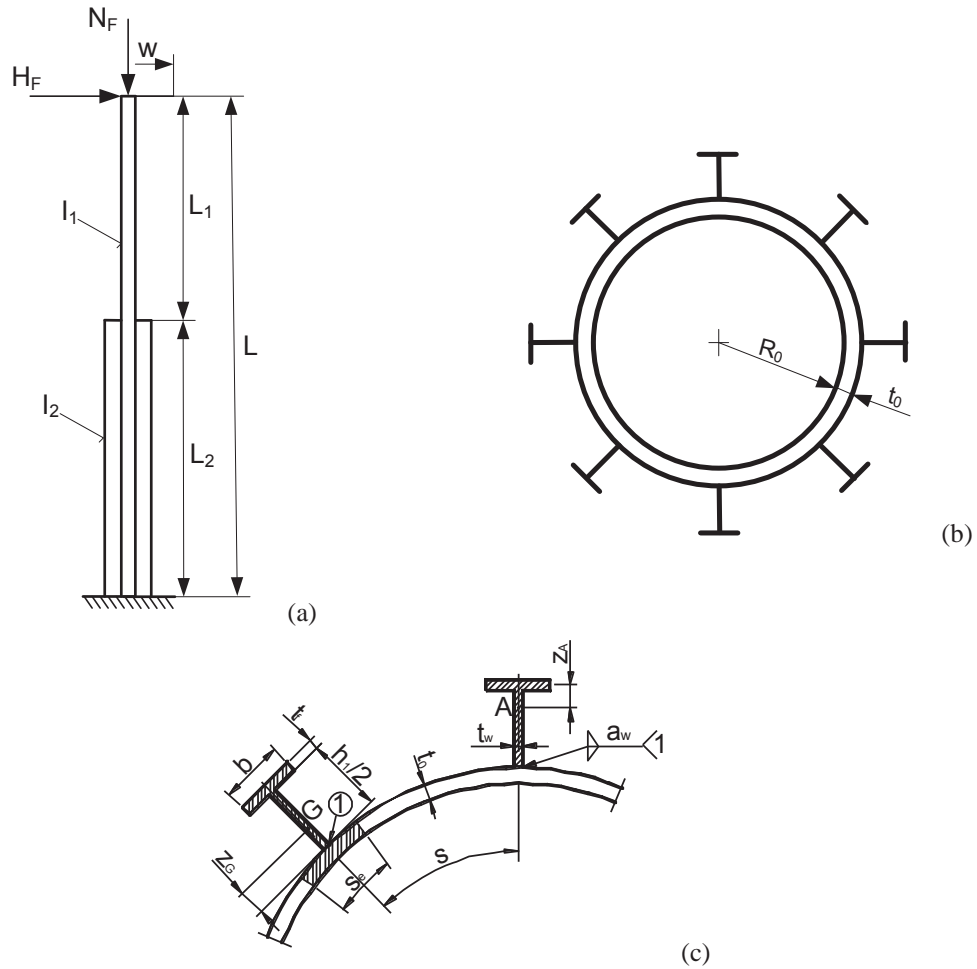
(a) Cantilever column loaded by a compressive and a horizontal force, the horizontal displacement w and the outside diameter are limited, (b) cross-section of the column, (c) dimensions of the stringer stiffeners
